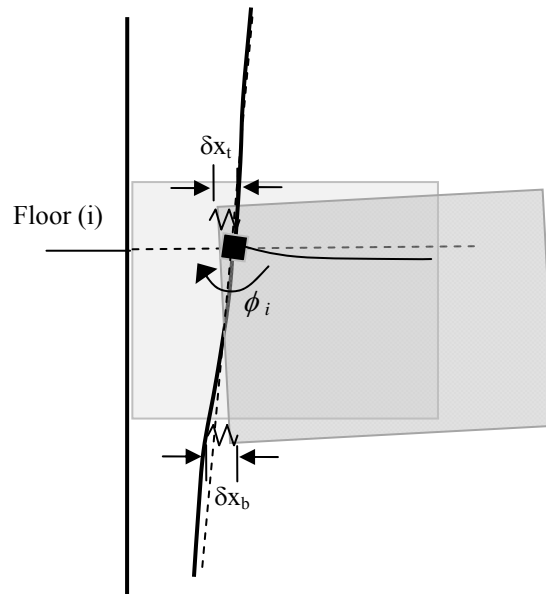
Close-up view of one side of spandrel panel showing deformation of push-pull connectors
